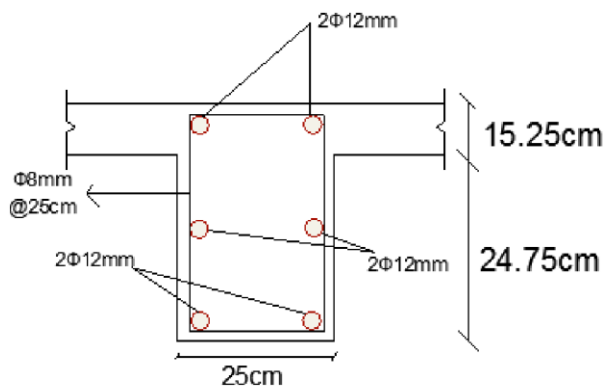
Steel Reinforcement that connect two parallel beam transversal section
